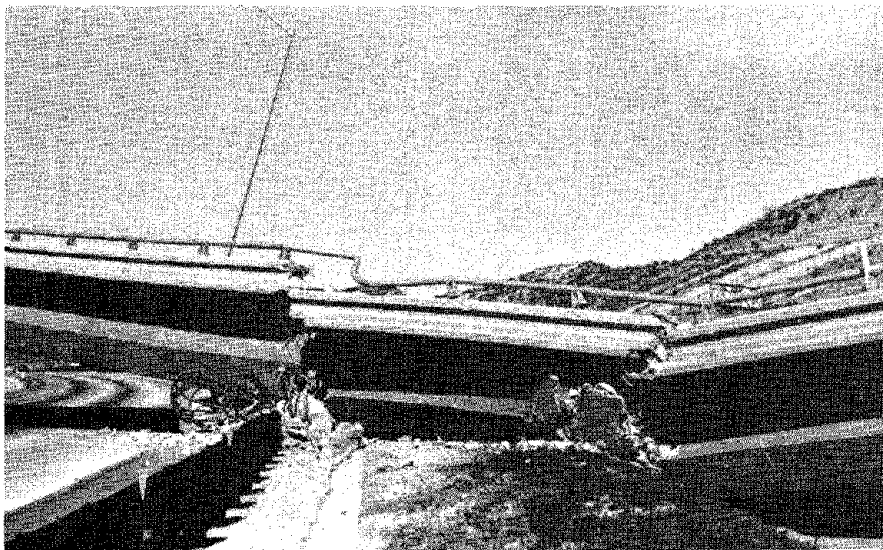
Route (Truck Lane)/405 Separation bridge. Breaks in super-
